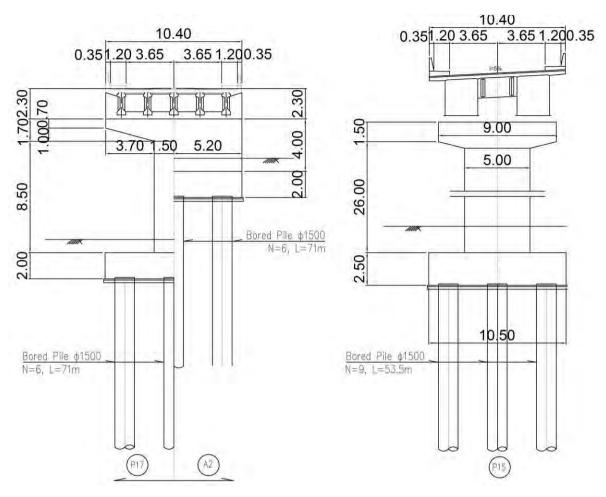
Substructure and Foundation Shapes for EZ
